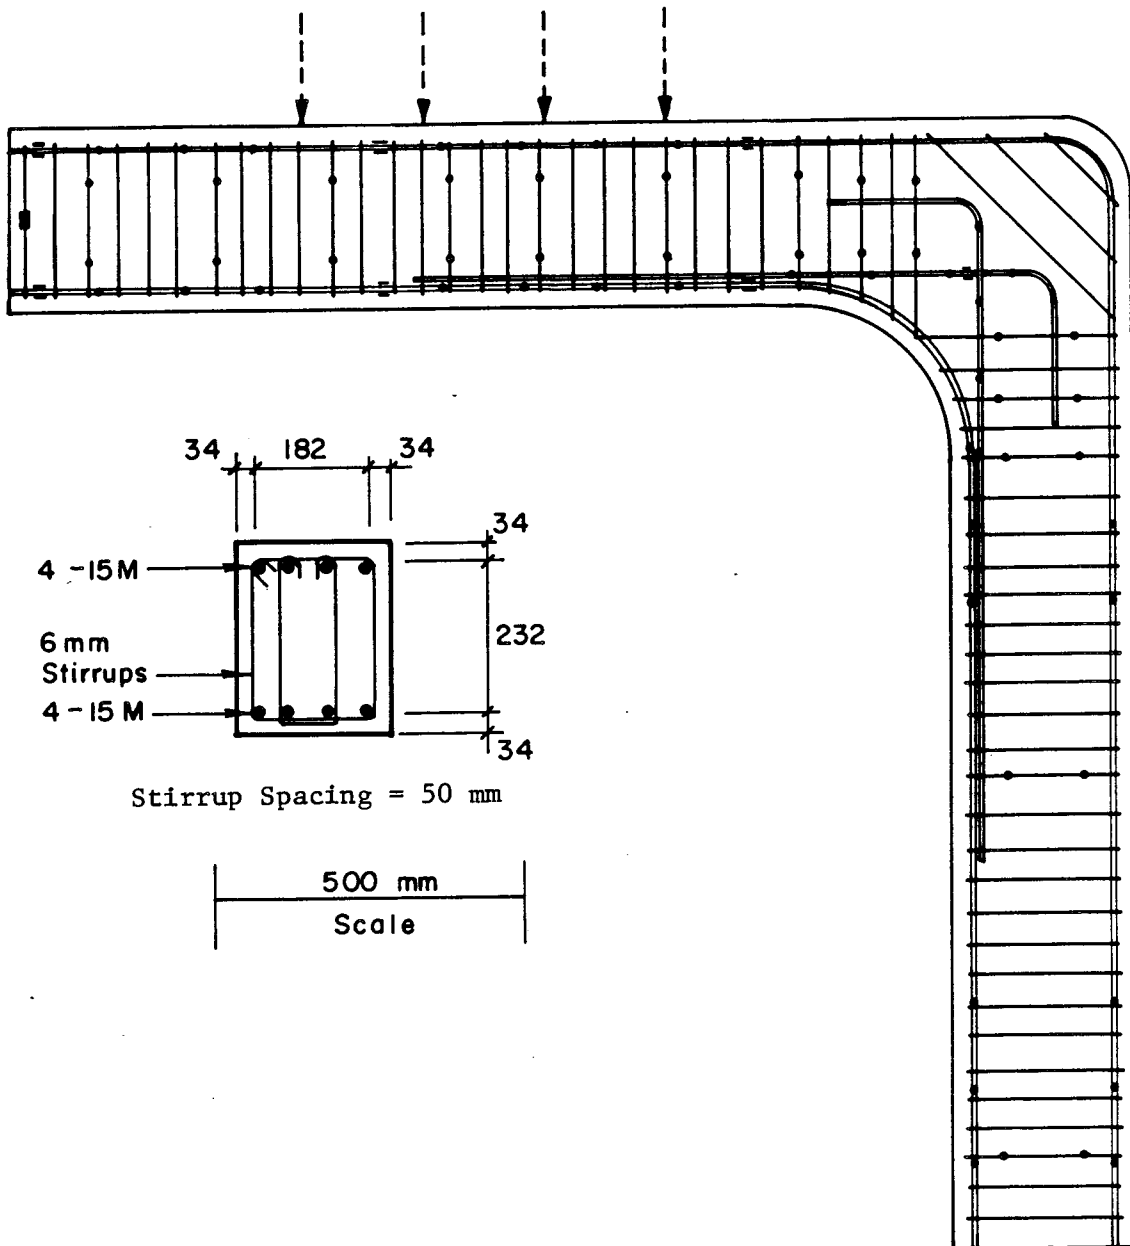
Reinforcing Layout for Specimen B1 (Abutments not Shown)
